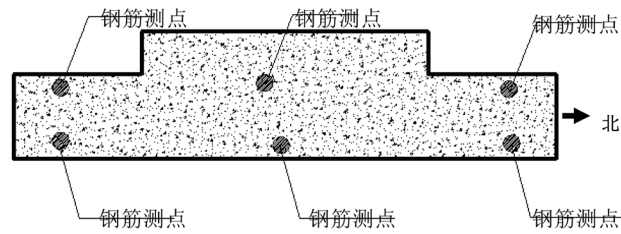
Sketch cross-profile graph of steel reinforcement in prefabricated slab track
